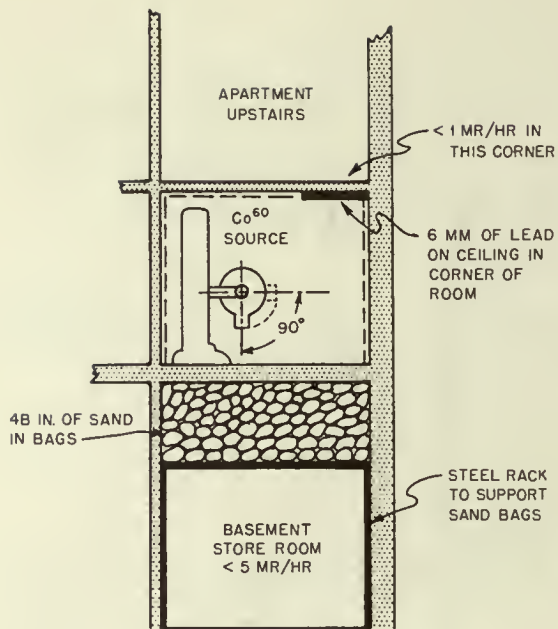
Elevation plan of the Silverstone-Simon private-office-unit Co⁶⁰ teletherapy laboratory.
